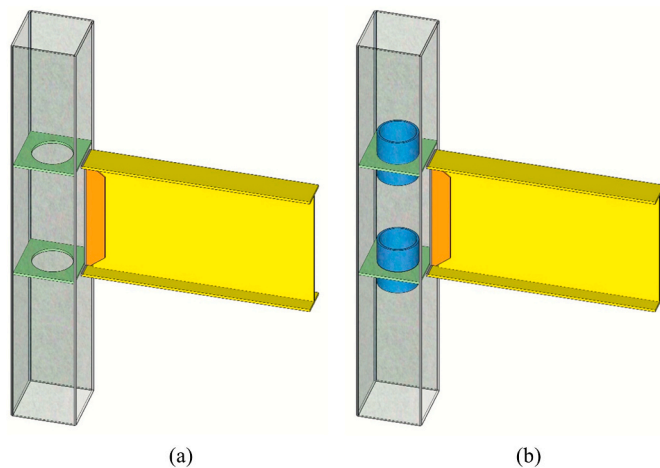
Tested connection specimens: a) Specimen 1: Internal diaphragm (ID); b) Specimen 2: Stiffened internal diaphragm with pipe (SID).
